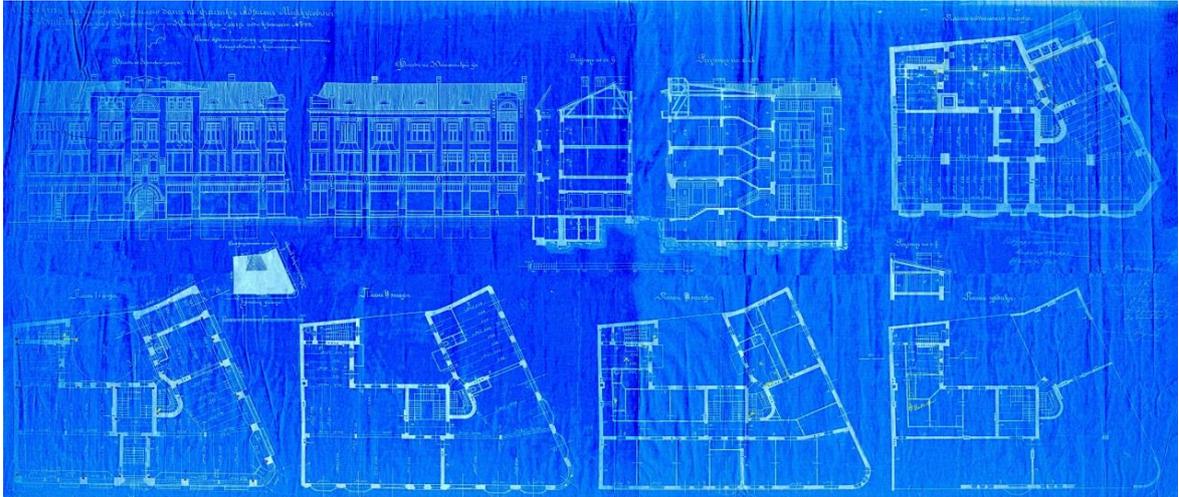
Blueprint of the construction design of the trading and apartment house at Graudu iela 45. 1913
